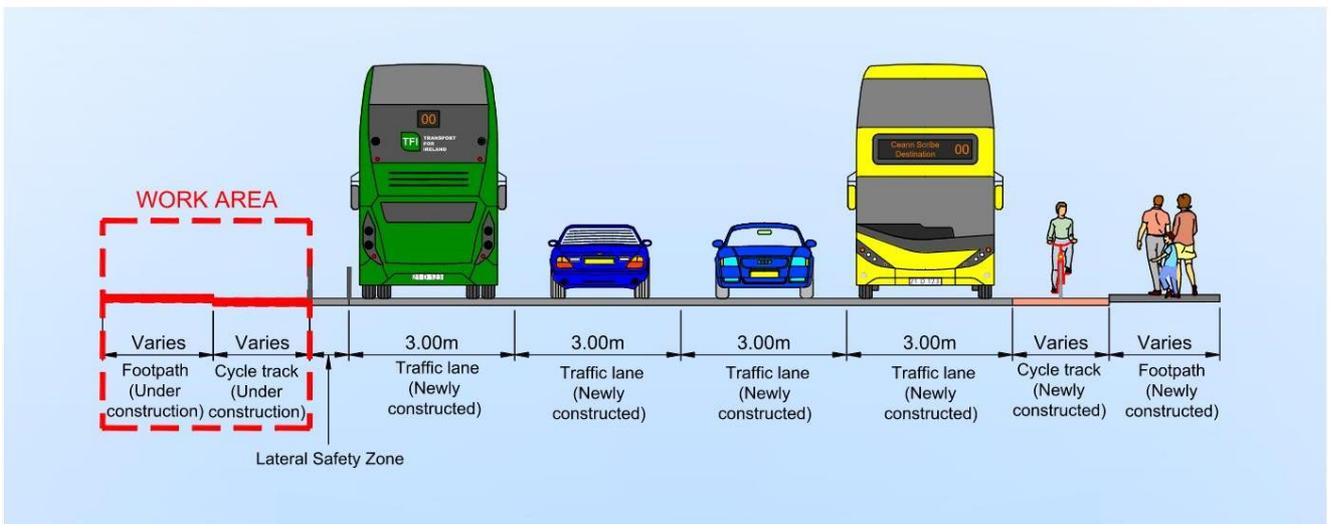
Traffic Management Cross Section, Section 7b – Stage 3
